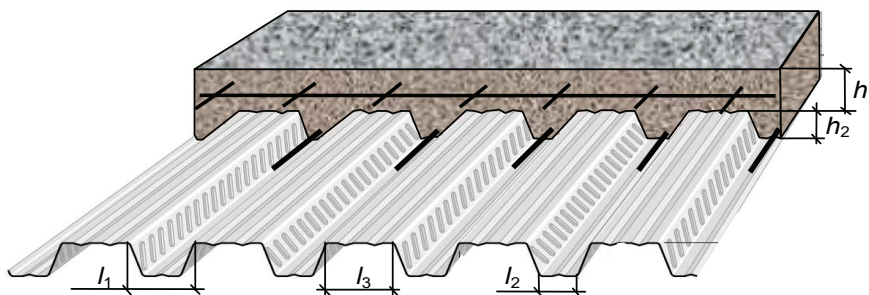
Construction of a steel-reinforced concrete slab with profiled steel sheet
